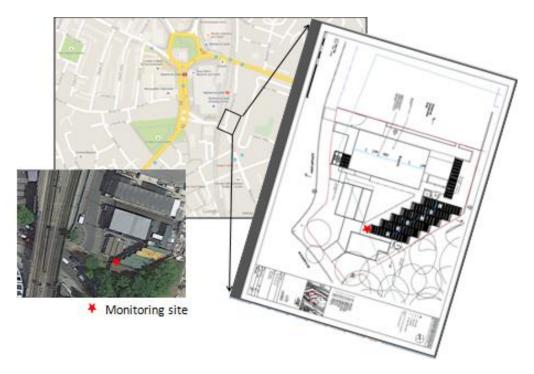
Location, layout and aerial view of the Artworks Elephant and the monitoring site
